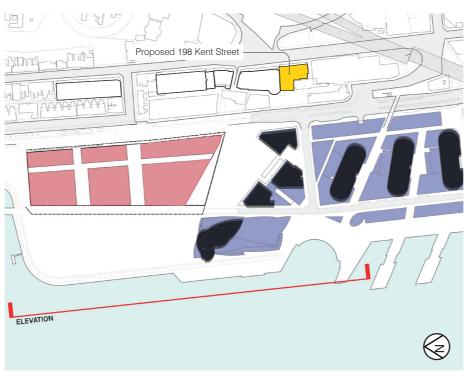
Plan View (Source: Modified from SJB diagrams, July 2023)
